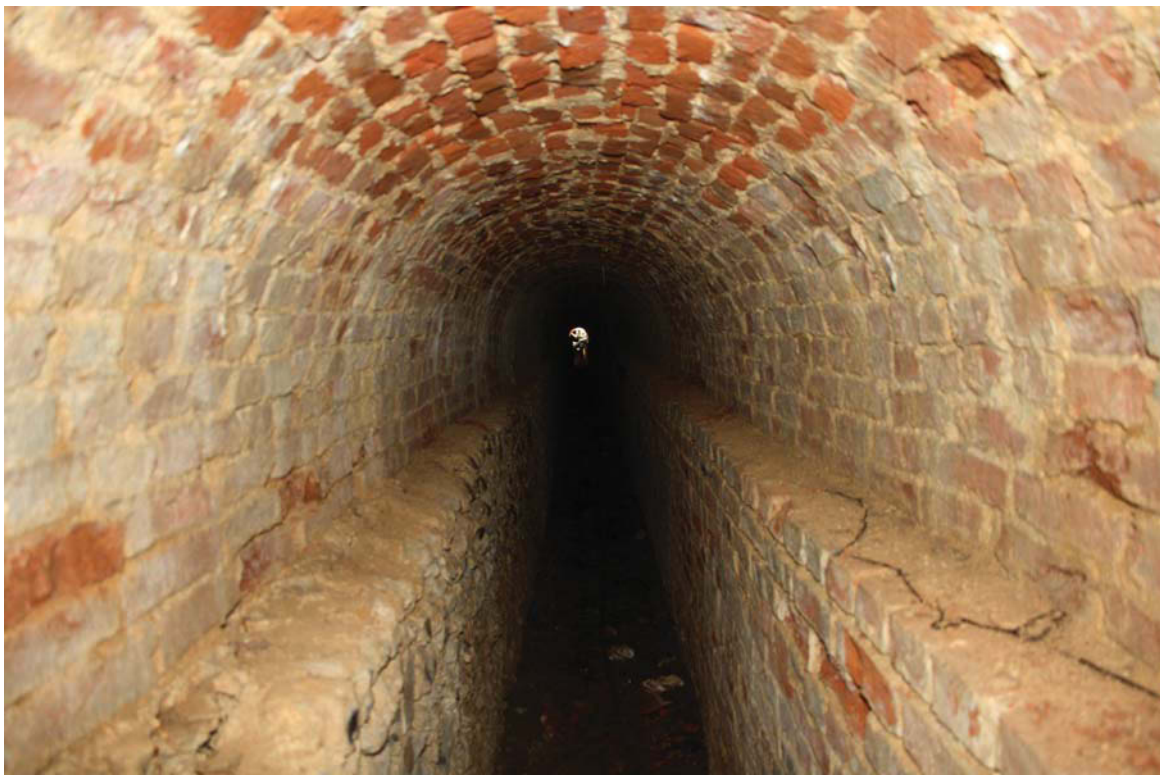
General view of tunnel from near southern blockage, looking north towards entry point
